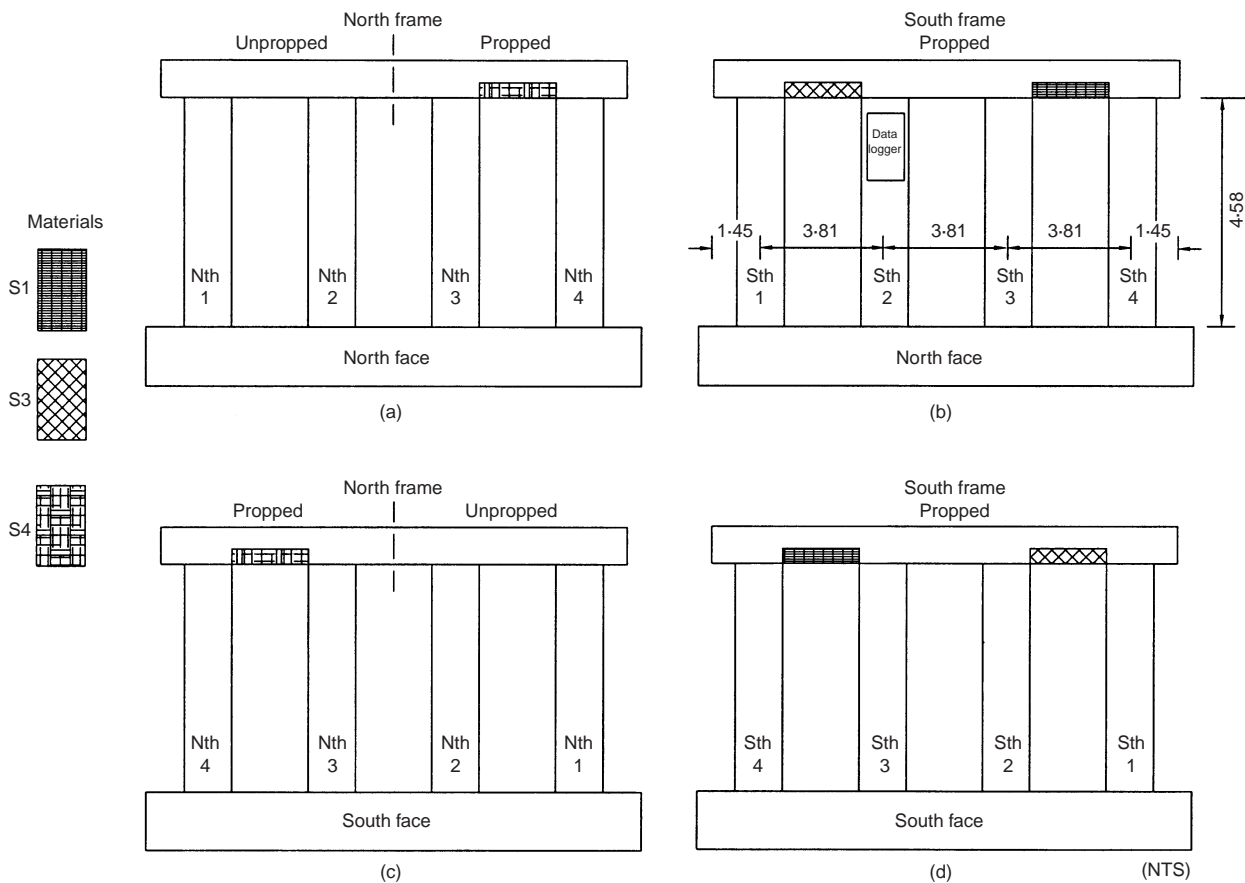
Substructure of Sutherland Street bridge showing locations of beam repair: (a) North face of north frame (half unpropped, half propped); (b) north face of south frame (propped); (c) south face of north frame (half propped, half unpropped); and (d) south face of south frame (propped) (all dimensions in m)
